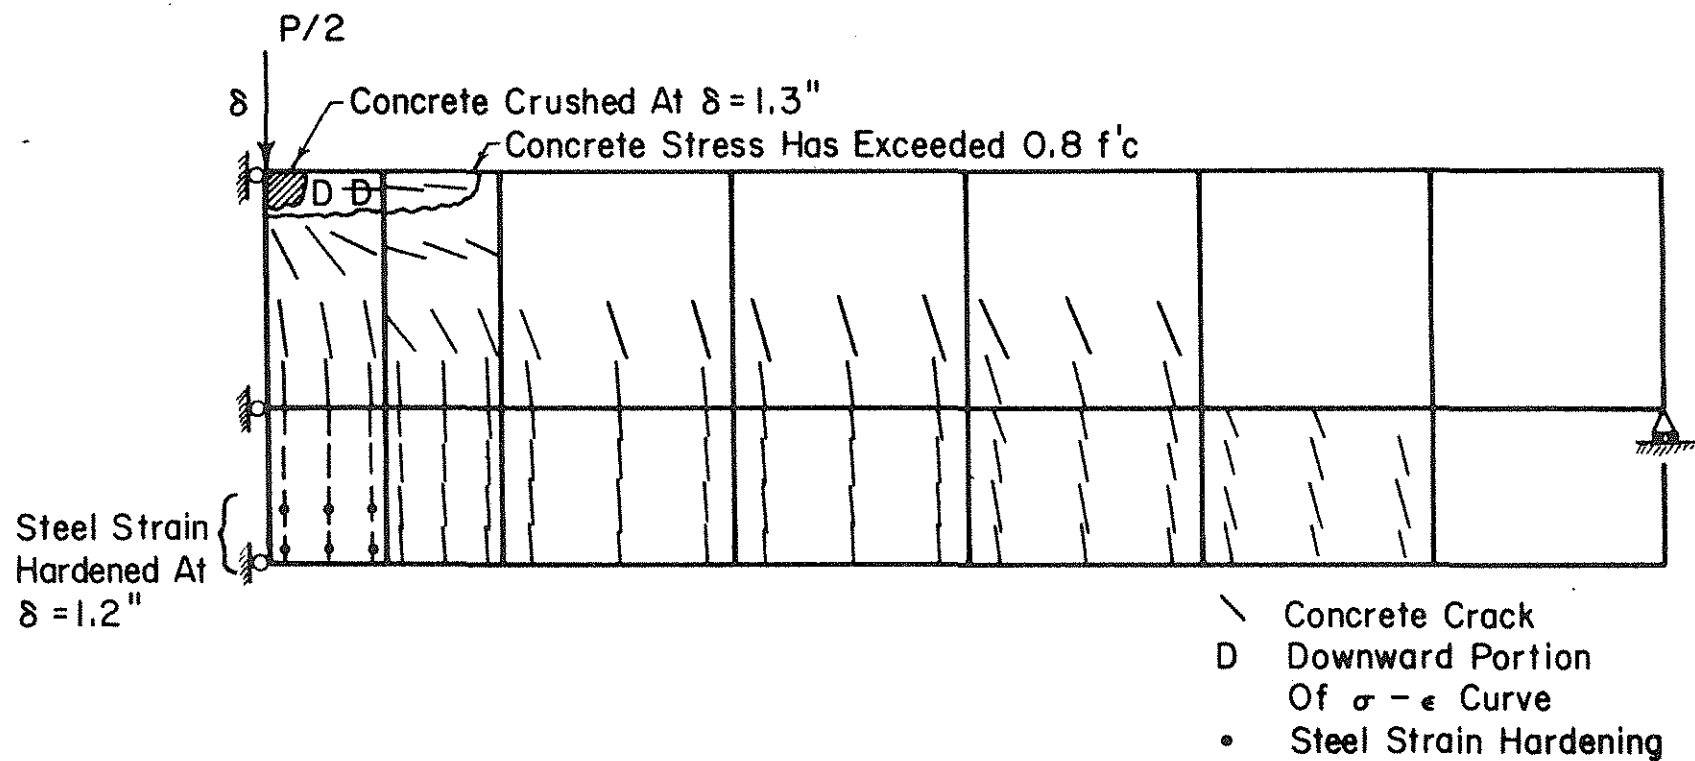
Analytical Crack Pattern for Beam Test Specimen J-4
